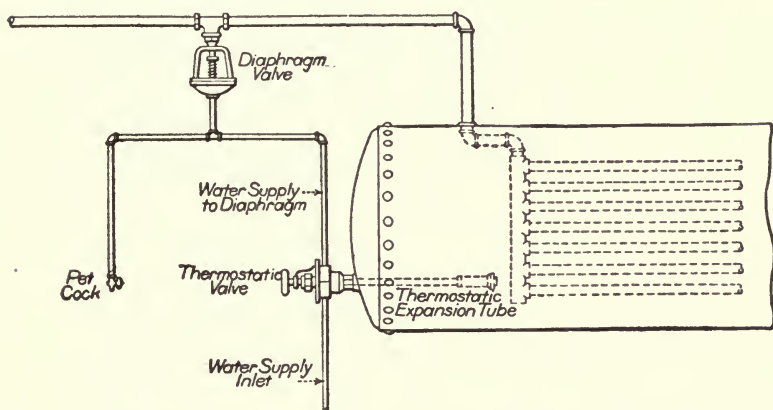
Thermostatic Control of Steam Supply to Coil.
